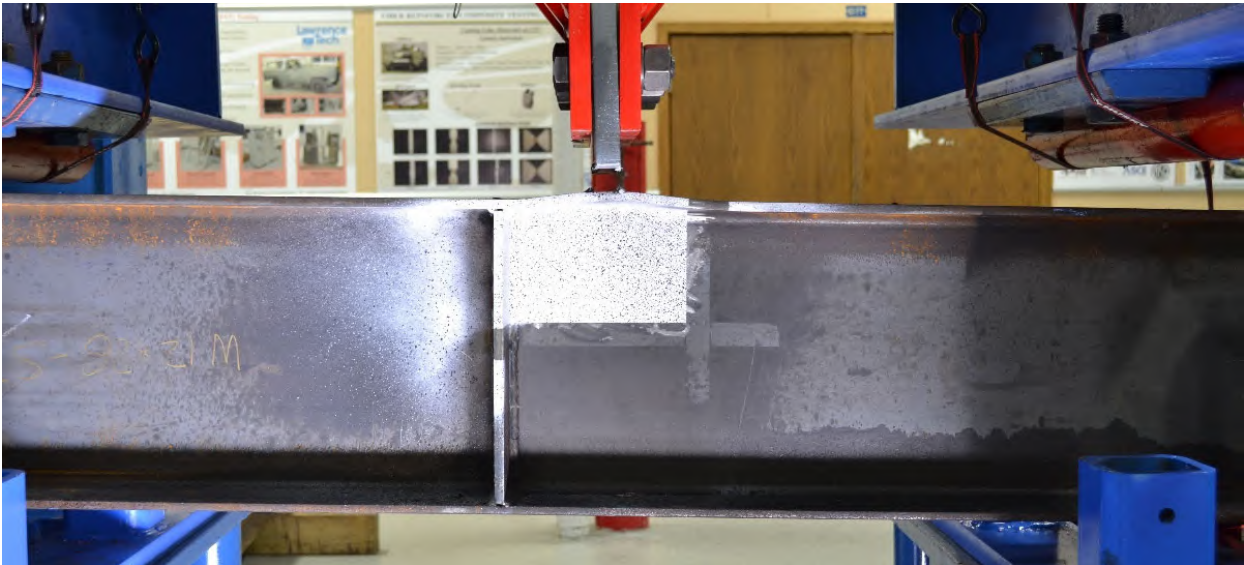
Weld fracture of W12X26-ST-NA
